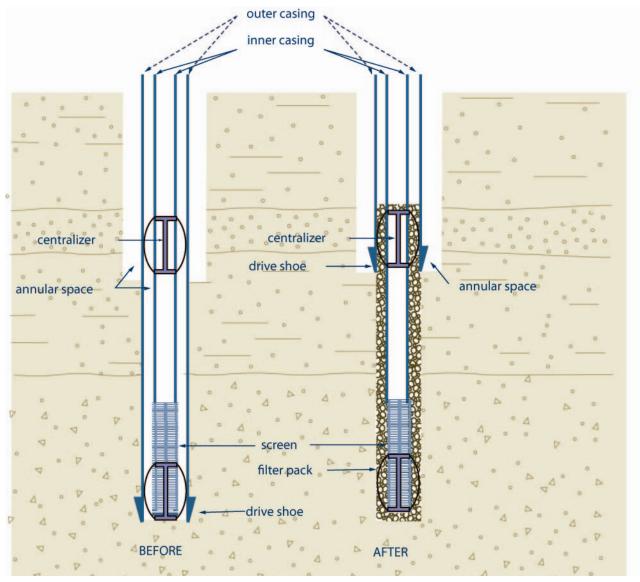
SINGLE STRING METHOD USING OUTER CASING
